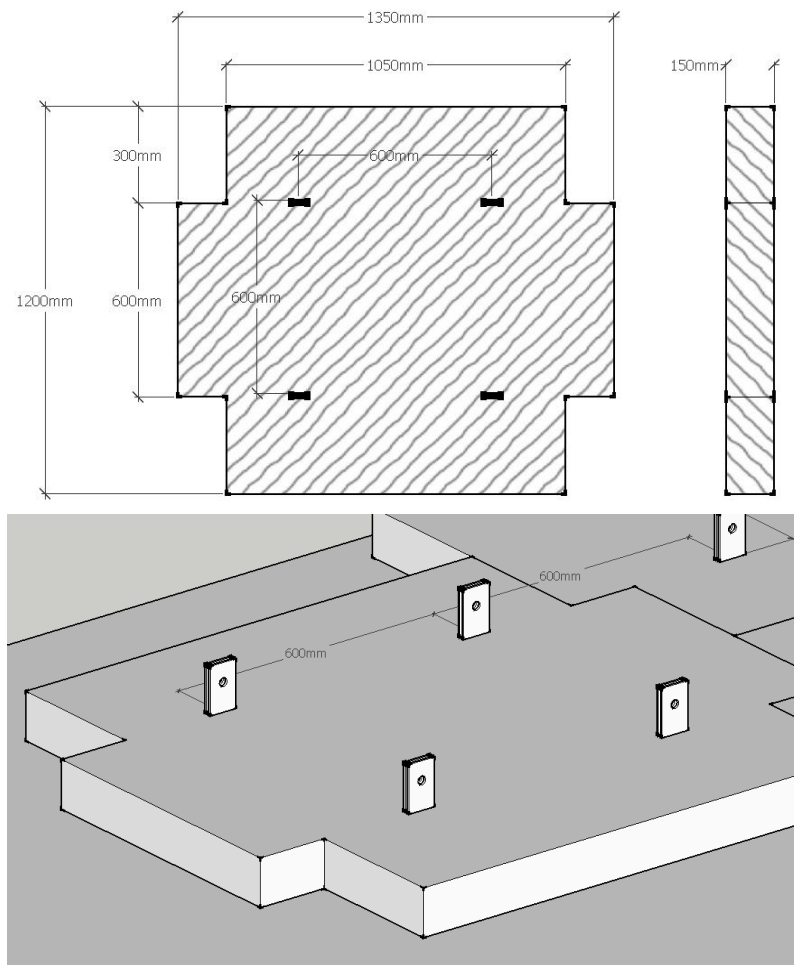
11 Cruciform precast concrete panel shape and dimensions.
